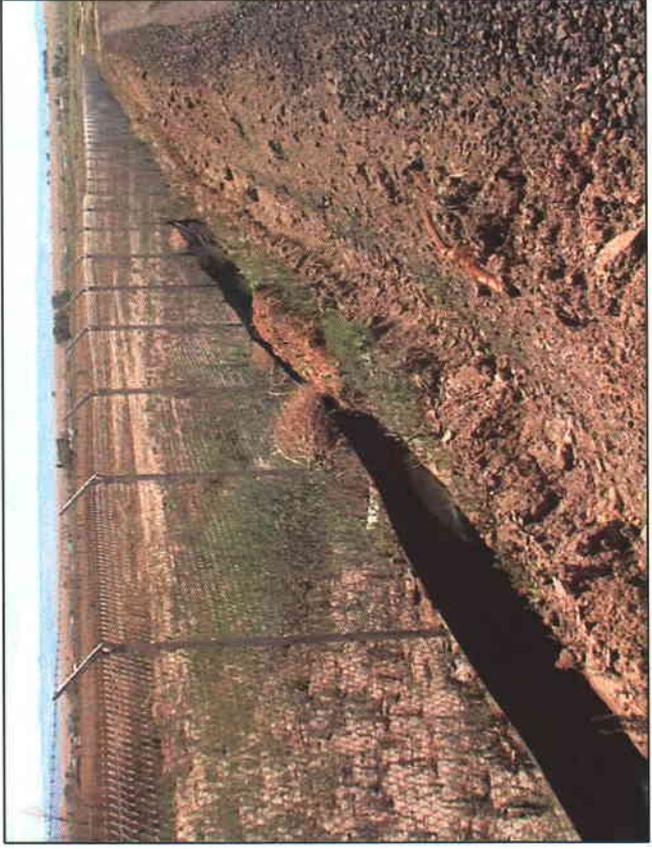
Silt fencing and straw bales used to complement drainage system and preclude sediment erosion off site.
